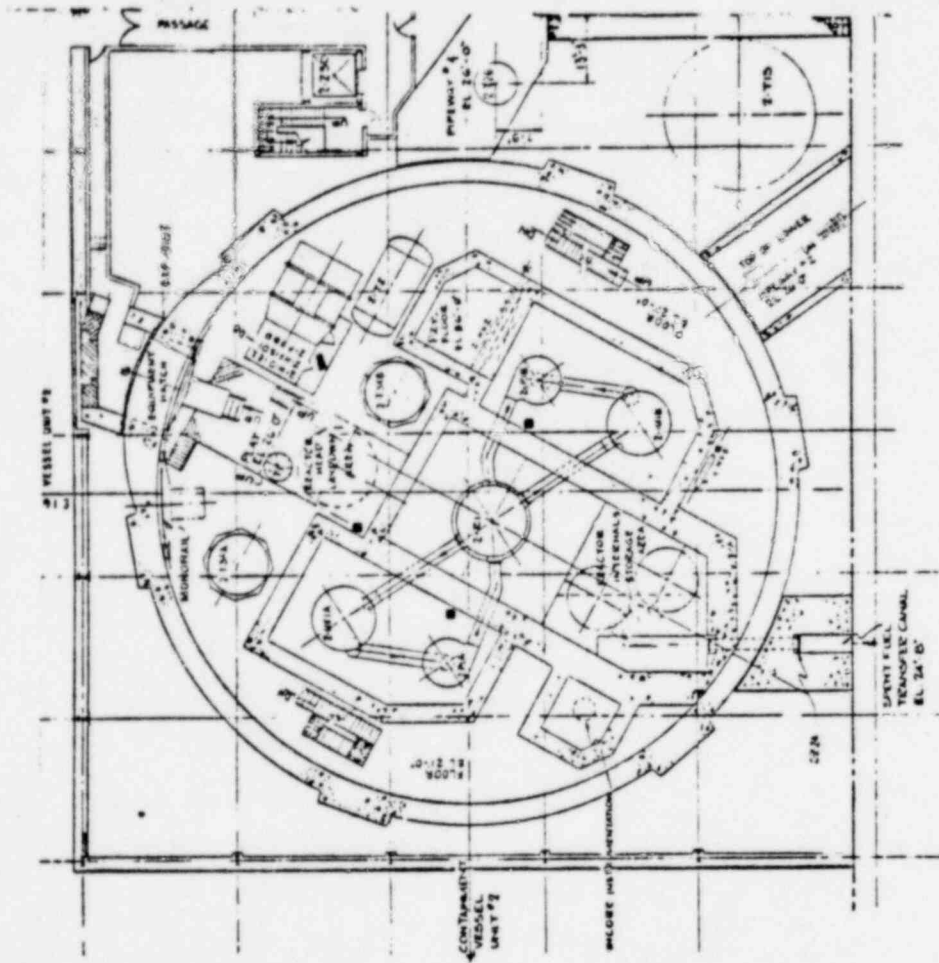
PBNP CONTAINMENT - PLAN VIEW
